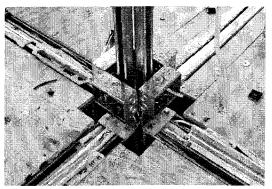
B-Line recycled steel columns and beams are bolted together to form an open building system.
